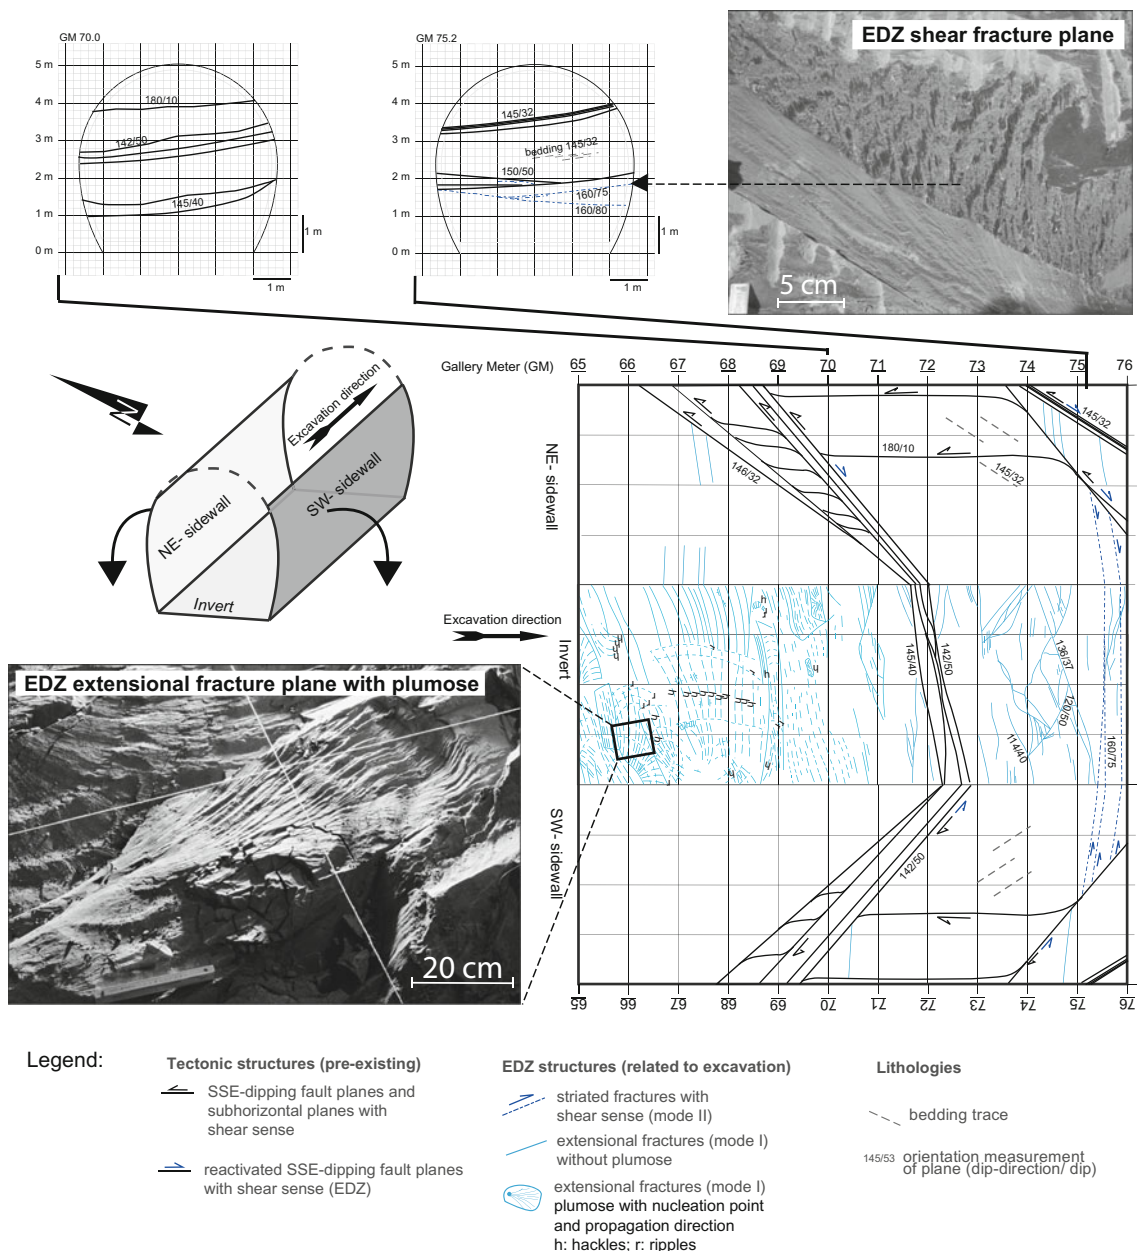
Detailed mapping of the tunnel floor and sidewall in Gallery 08 between gallery metre GM 65 and GM 76. For location refer to Fig. 4. The mapping revealed metric-scale, sub-horizontal extensional fractures on the tunnel floor. These fracture surfaces are characterised by a plumose structure with ripple structures and well developed fringe zones (e.g. *en échelon* or hackle structures) indicating the fracture nucleation point and the propagation direction. Mainly
